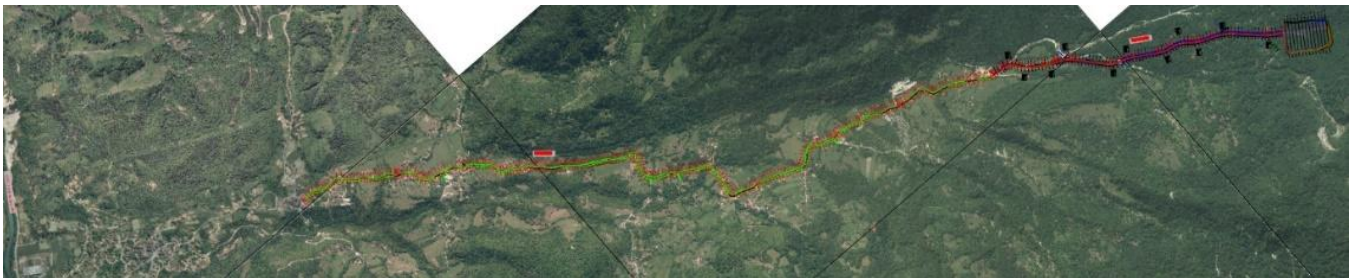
Overview of sections NR1 and NR2 of access road to the Prenj Tunnel on the northern side
